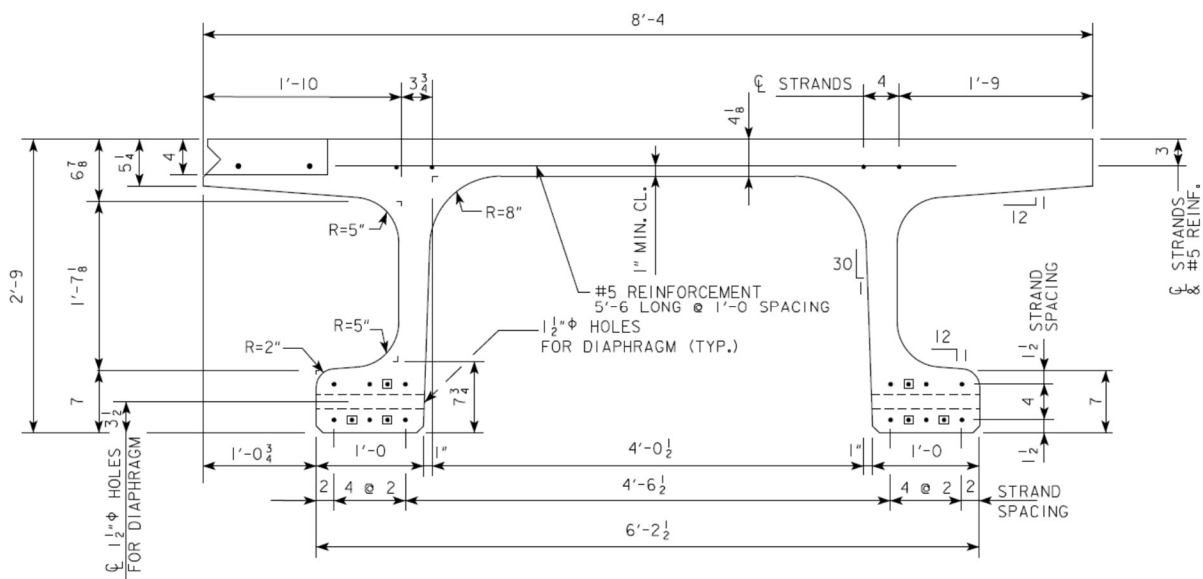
Cross Section of Jackway Park Bridge UHPC Girder (Bierwagen, et al., 2010)
